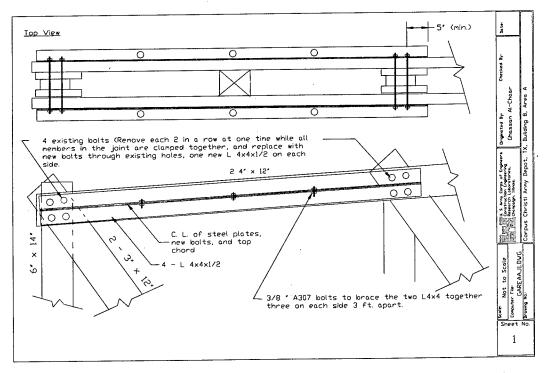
Proposed repair for decayed Joint B of Truss 24.5.
